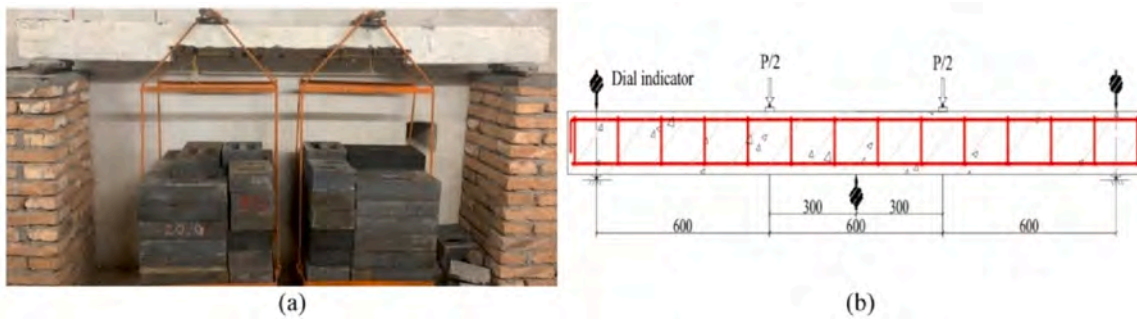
Test setup of long-term loaded RC notched beams: (a) site layout; (b) loading diagram (mm).
